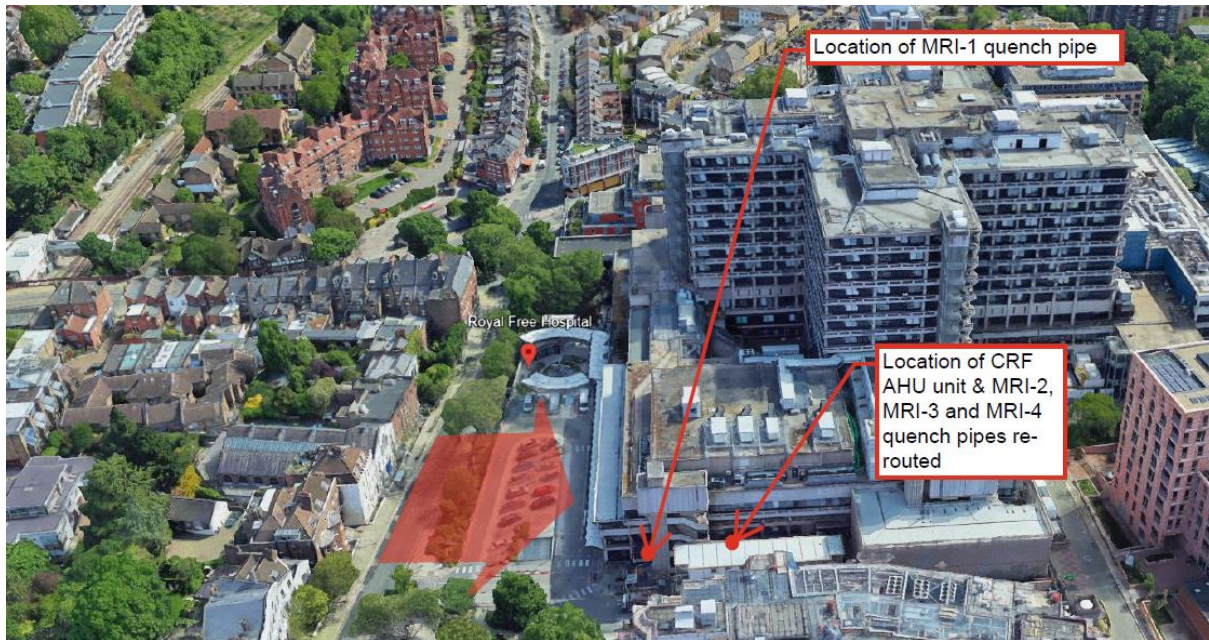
The buildings on Pond Street within the conservation area do not have direct views of the new CRF AHU unit or re-routed MRI-2, MRI-3 & MRI-4.
